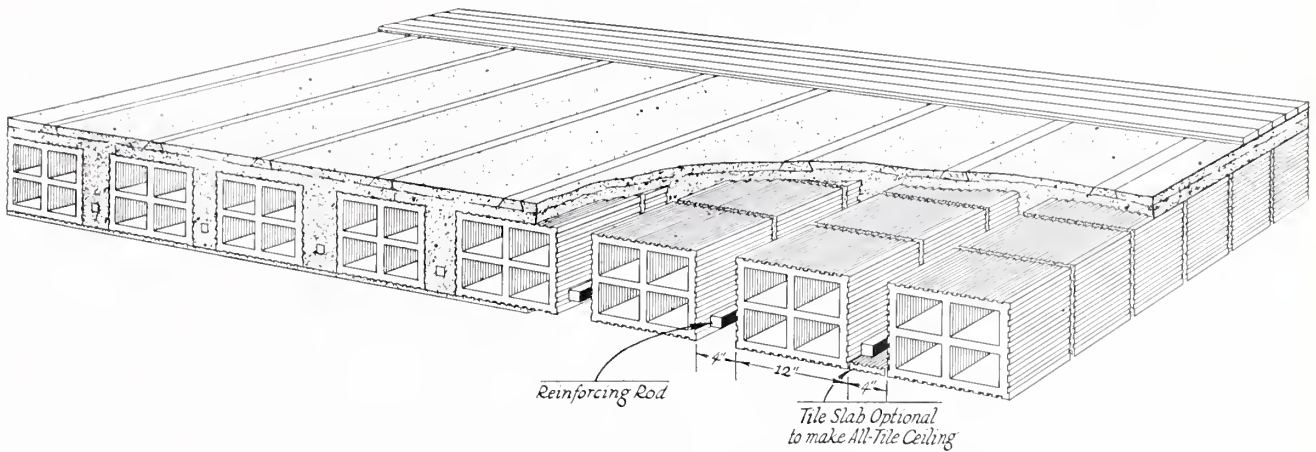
Section of Combination Hollow Tile and Concrete Floor, showing method of construction with or without All-Tile Ceiling.
